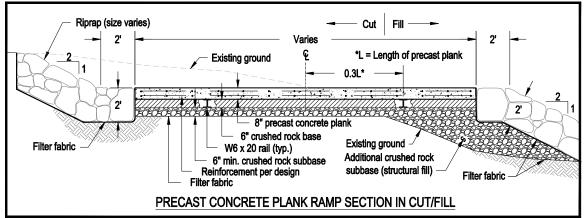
Precast concrete plank ramp section in a cut and/or fill situation
